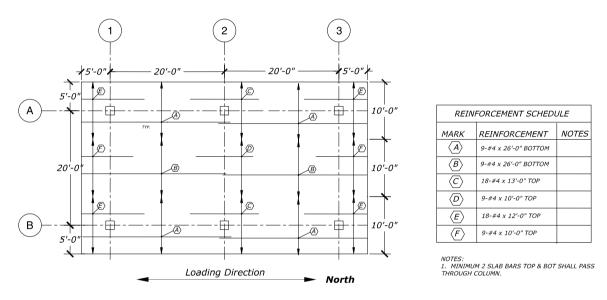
Original test structure – plan view. (1'' = 25.4 mm, 1'' = 305 mm).
